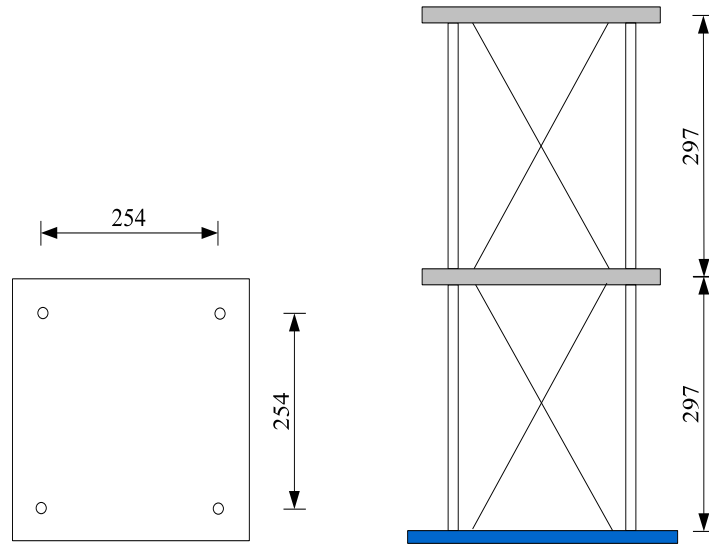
Plan and elevation view of the reduced-scale frame. Dimensions are expressed in mm.
